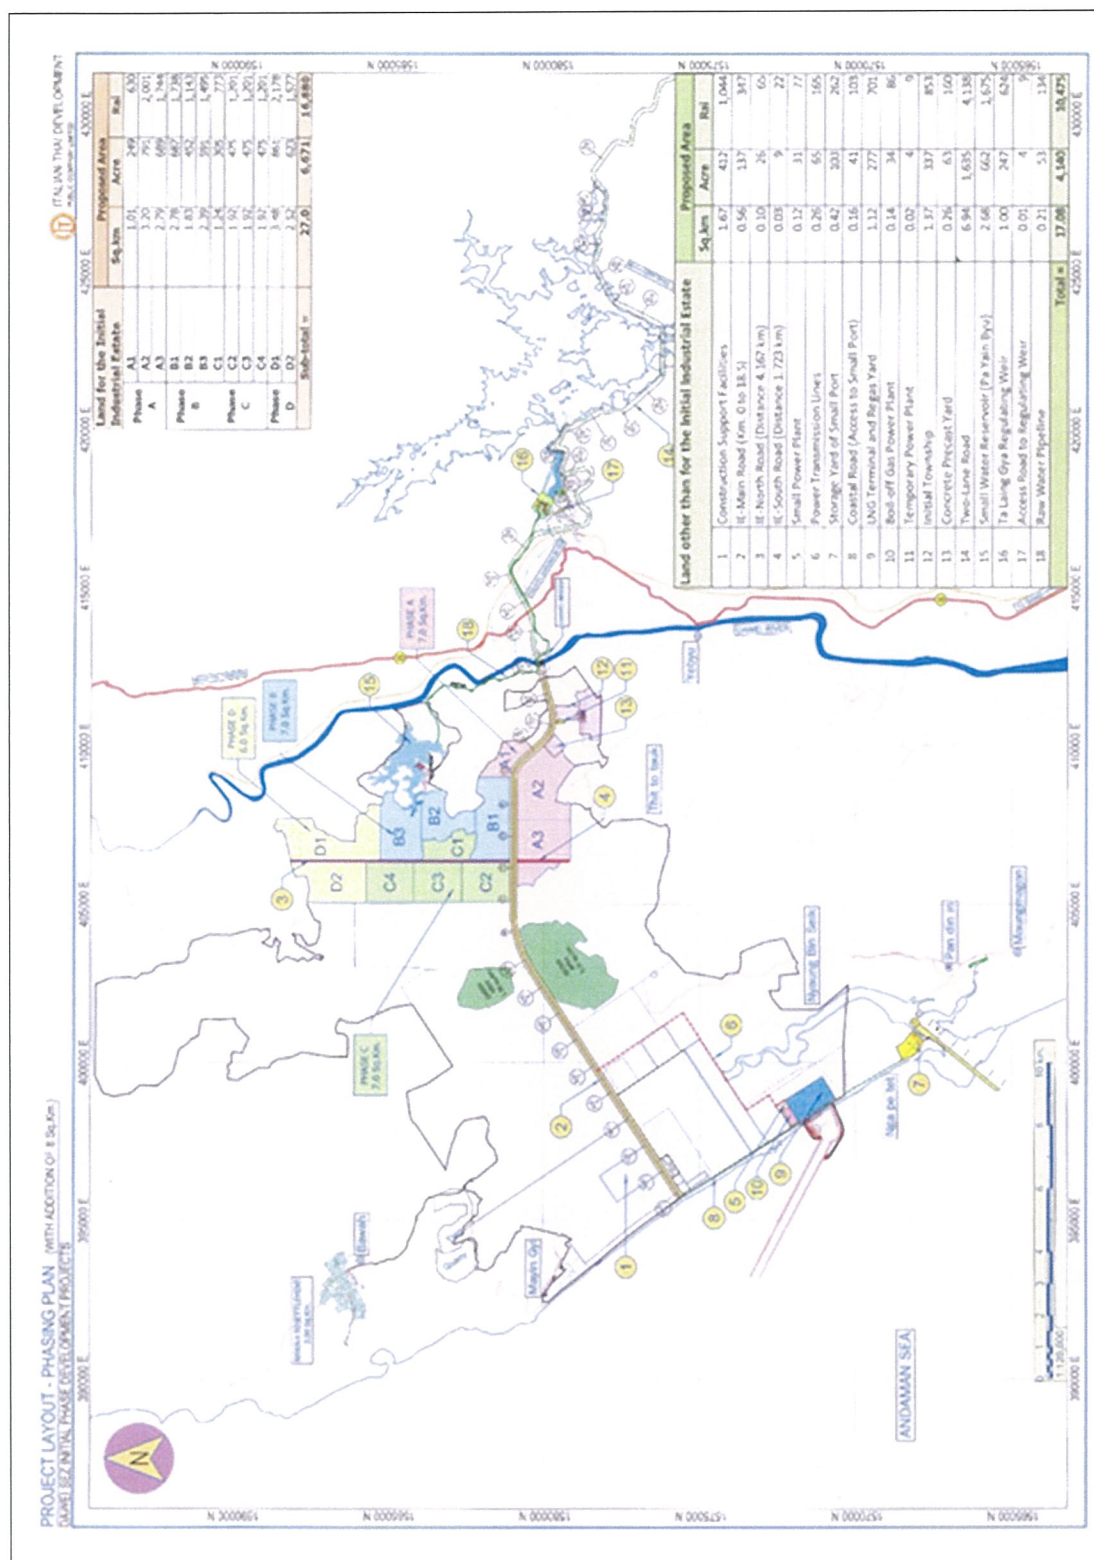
LAYOUT DSEZ AREA
